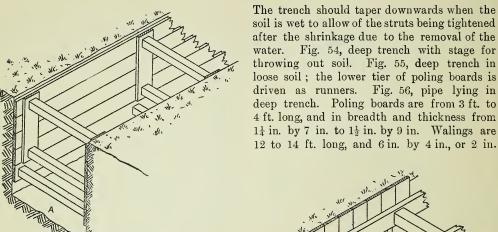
Horizontal Poling Boards with Vertical Walings.
